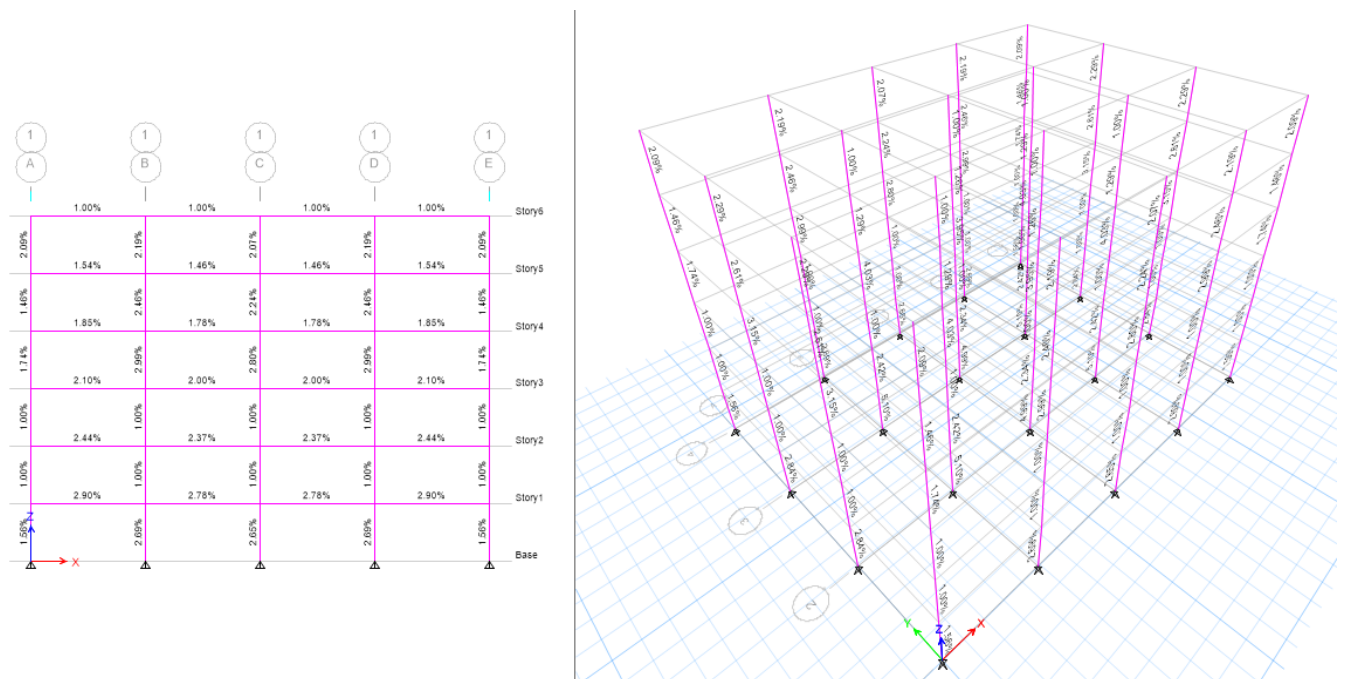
Output Design of the 6-Story Structural Building Showing the Required Reinforcement Area (mm) with Beam A (40cmX50cm),Beam B (30cmX45cm).
